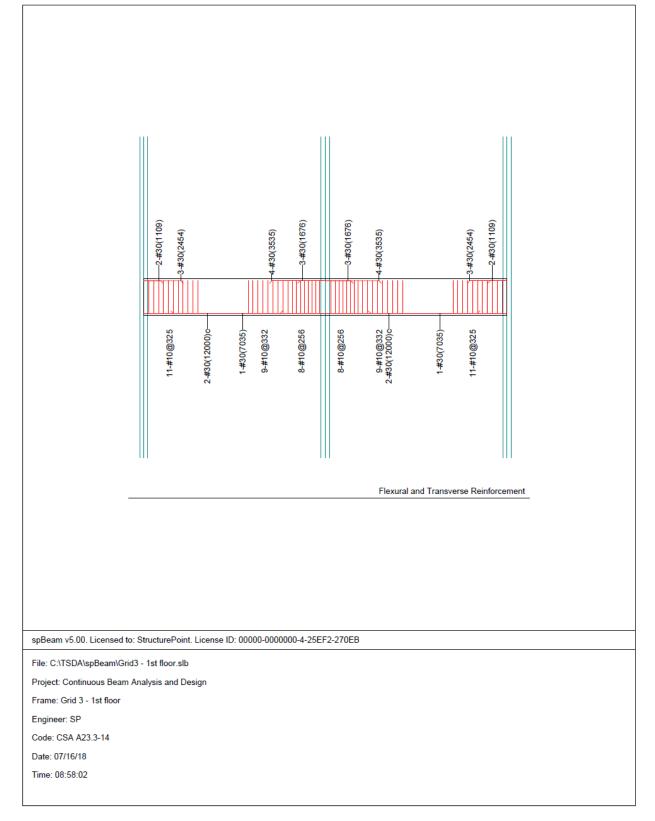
Longitudinal and Lateral Reinforcement (spBeam)
